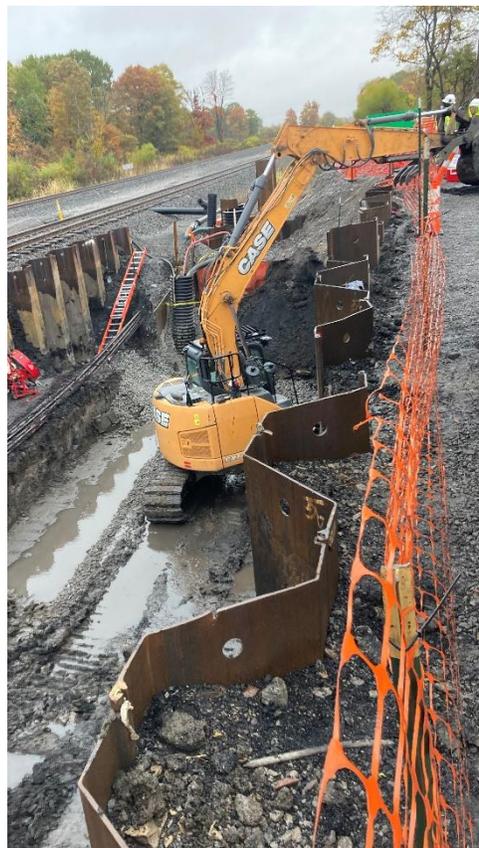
Contaminated soil excavation at the derailment site was completed on October 29, and the last truck of hazardous soil was shipped on October 30.
